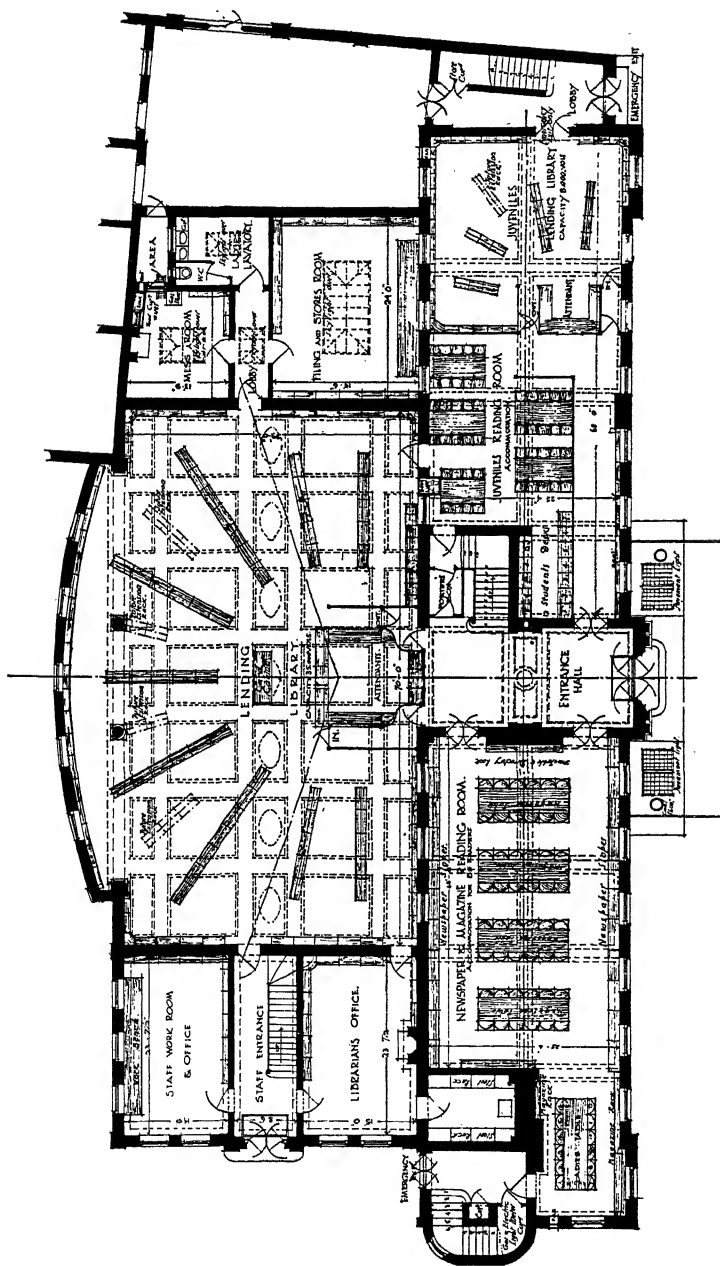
Bethnal Green Library, Ground Floor Plan (Section 174).
